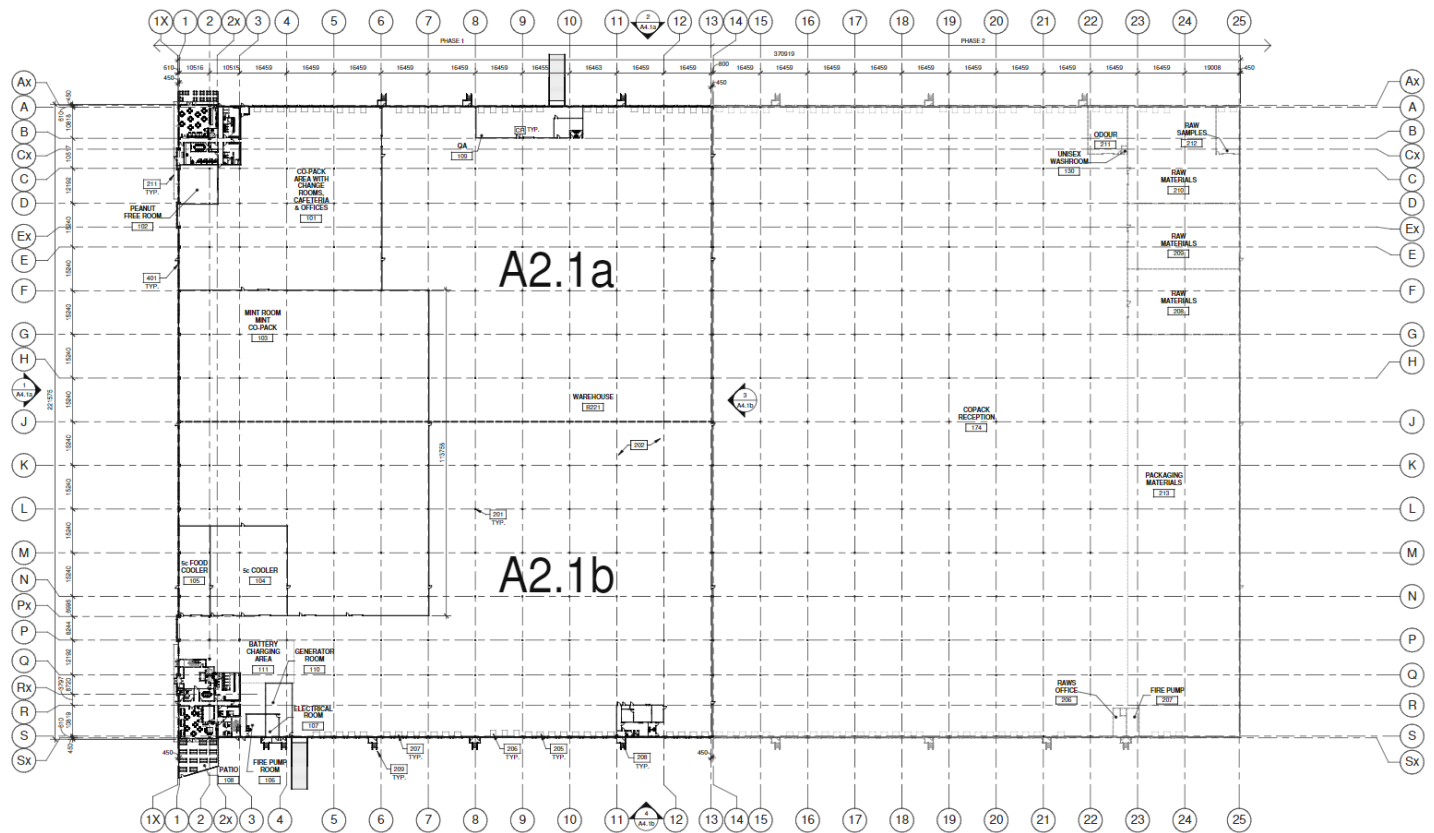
Mars Industrial Canada Overall Ground Floor Plan
